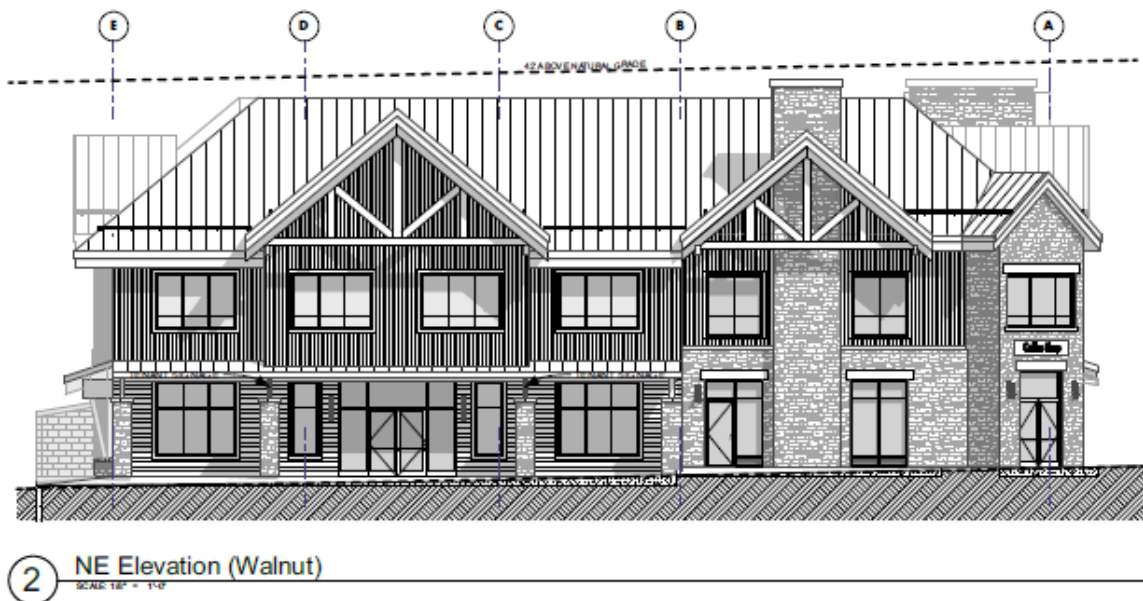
NE Elevation (Walnut)--Project Plans Sheet A-201
